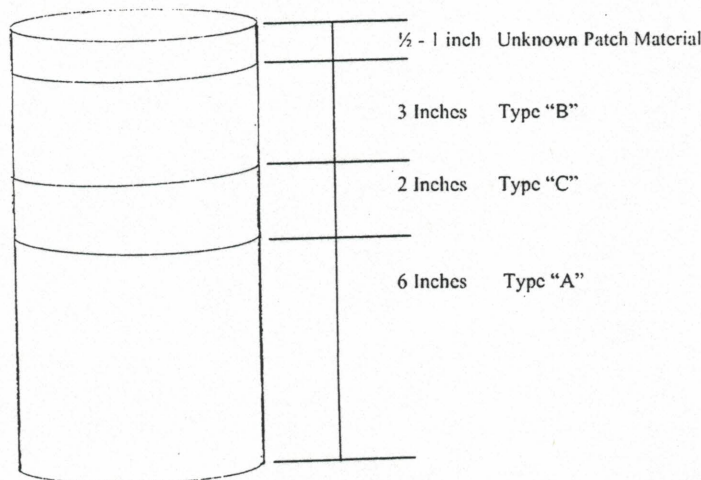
Diagram of Existing Asphalt Layers, Prior to NH-186(190) Construction.
